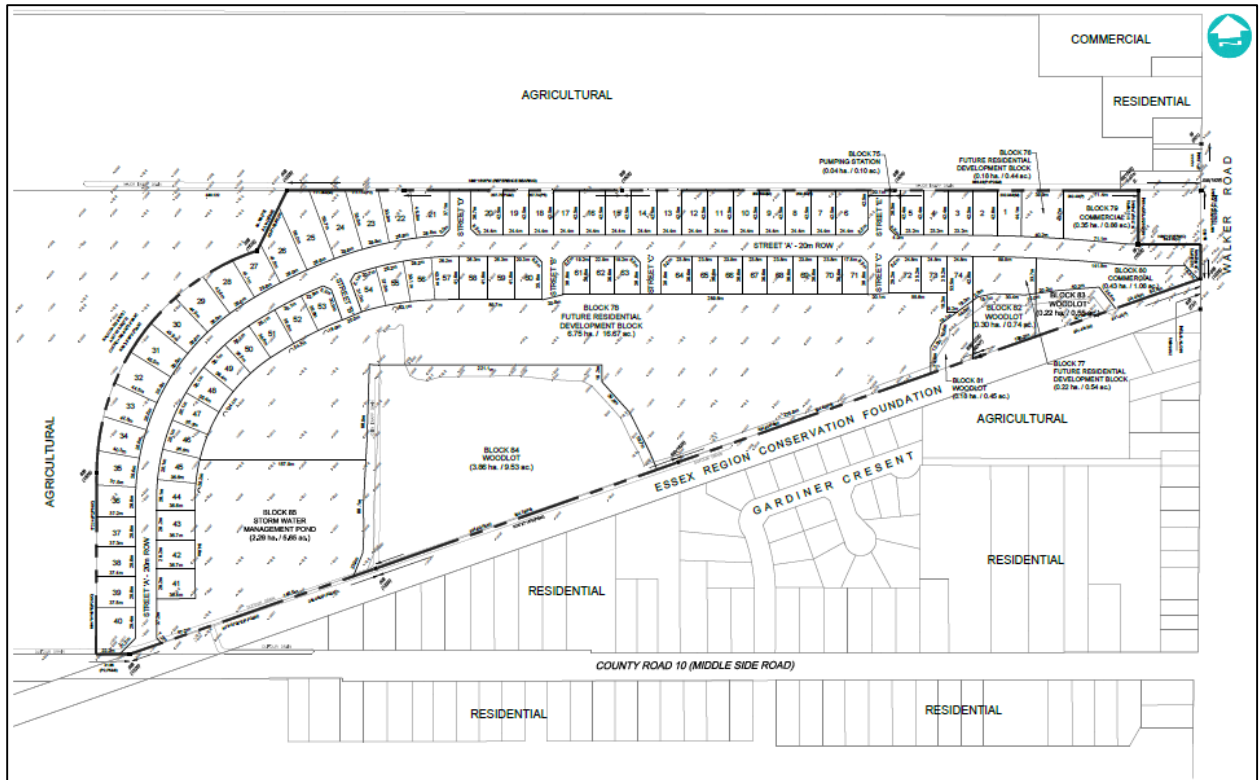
Draft Plan of Subdivision for Woodland Trails Subdivision
